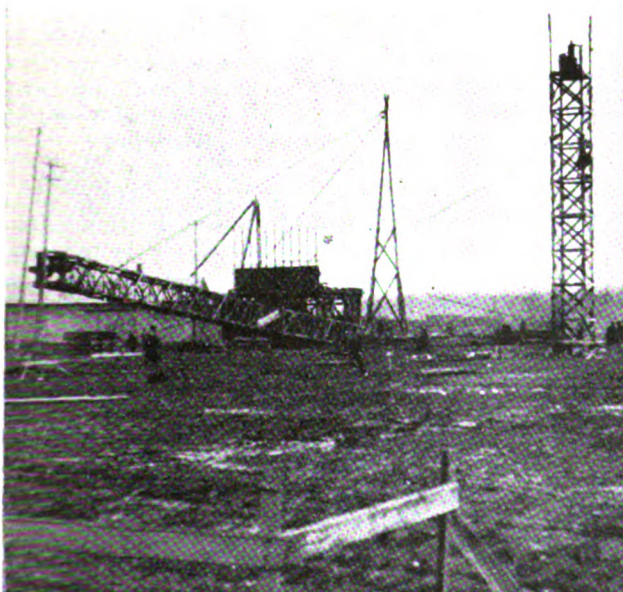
FIRST STAGE IN HOISTING TIMBER TOWER.
